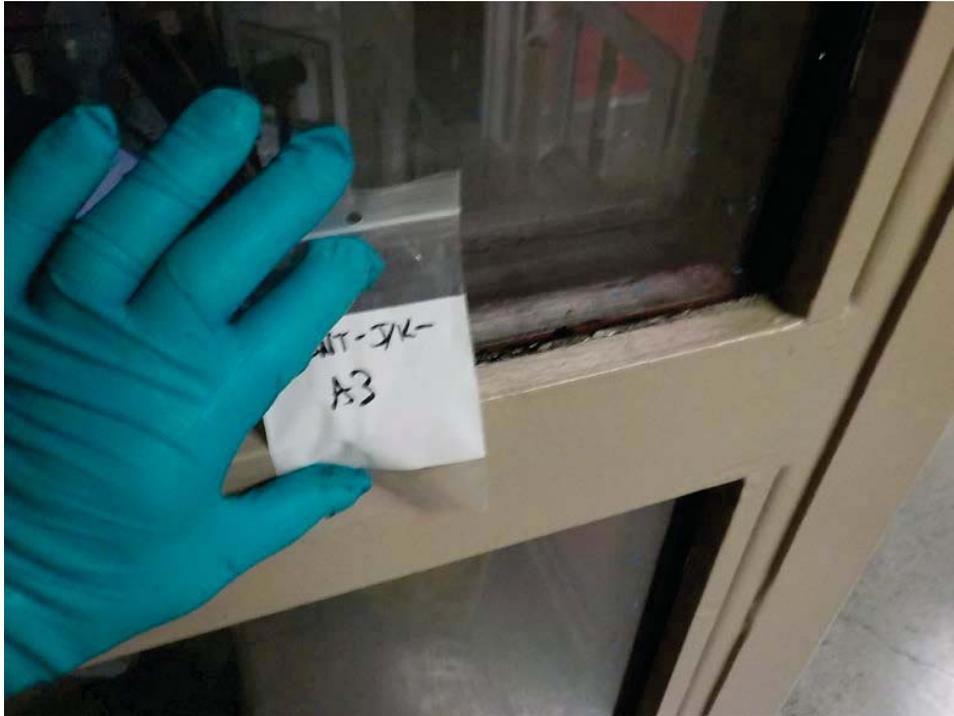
Lead-containing cream paint on the interior walls and window frames of the control post.
